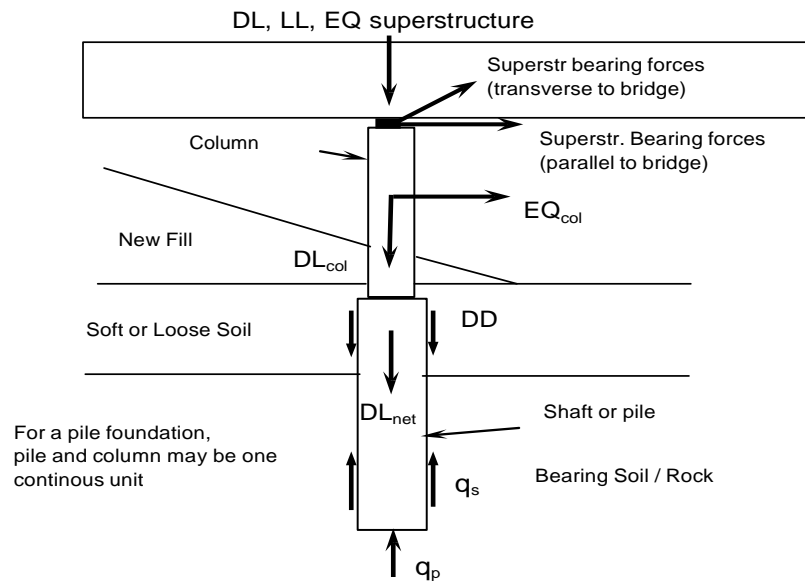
Definition and Location of Forces for Pile Bent Foundation
